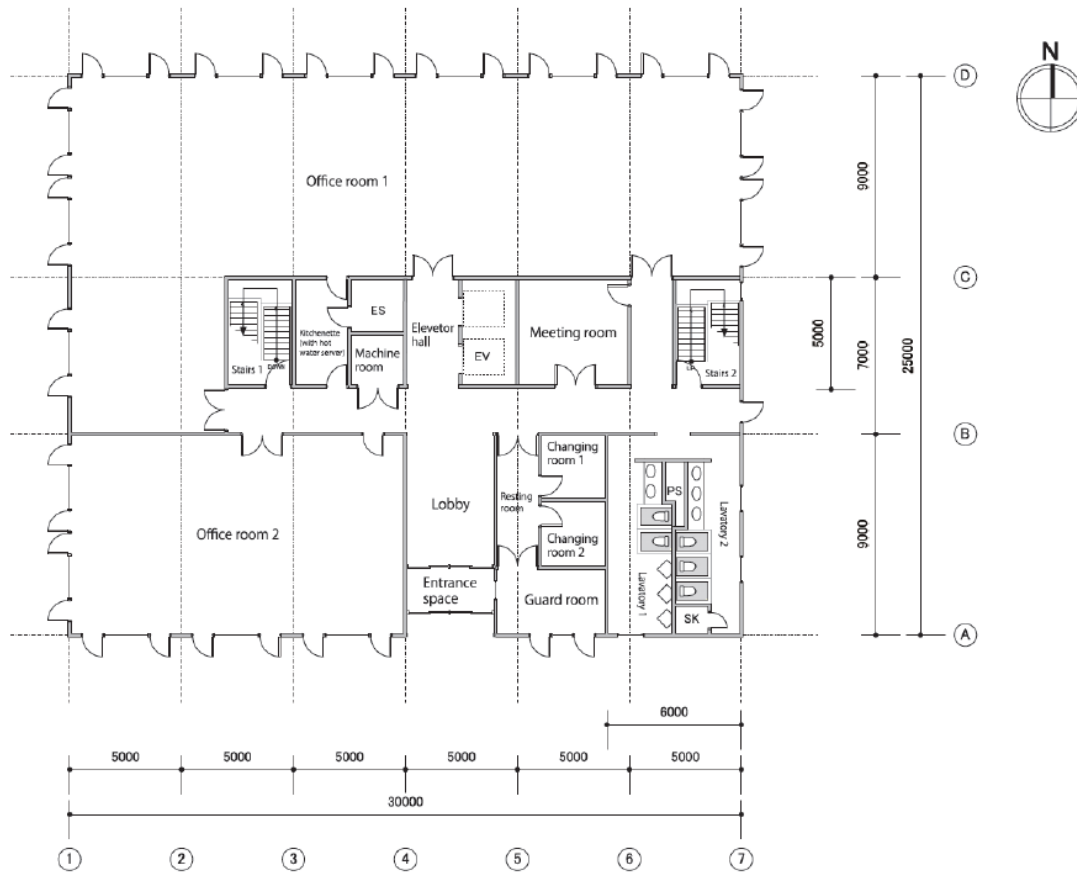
Second case study layout of building - Ground floor - ISO 18523-1-2016
